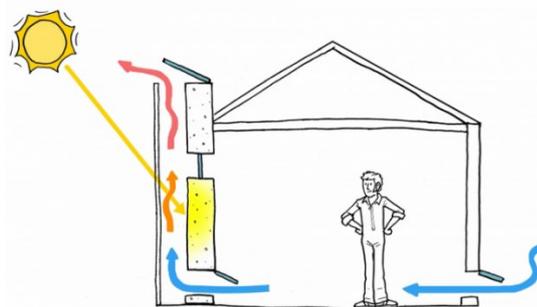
A Trombe wall can act as a solar chimney [63]
